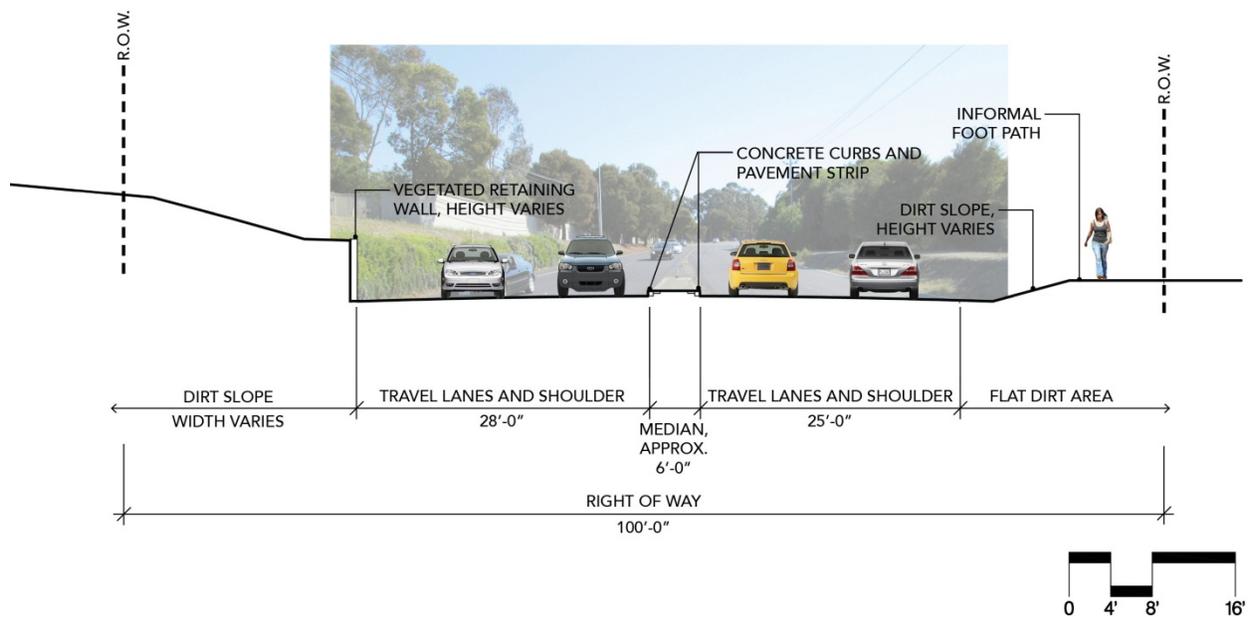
San Pablo Avenue Section 4 – Looking southbound near Hilltop Drive
